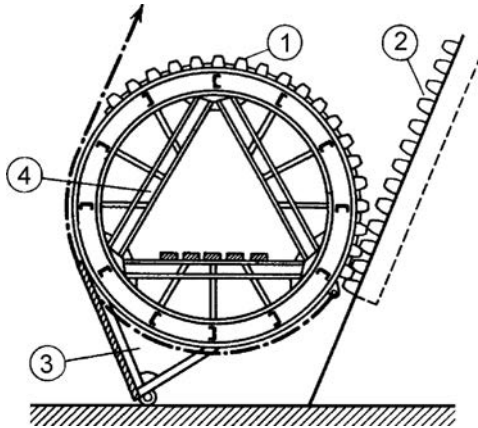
Construction of a roller gate with bottom shield and triangular diaphragm.
